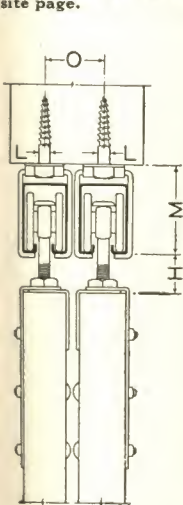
Cross-section showing overhead bracket attachment without weatherstrip, of two parallel sliding doors. See page 143 for dimensions.
